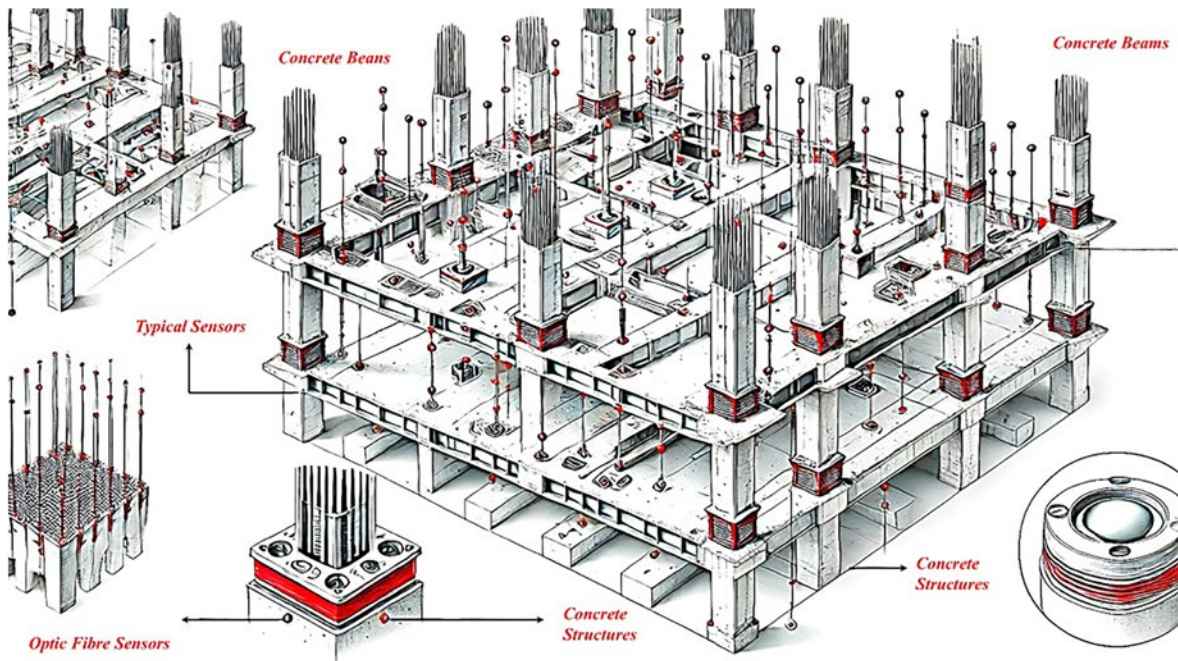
Essential positioning of the thermistor probe in reinforced concrete (RC) frames and vertical elements.
